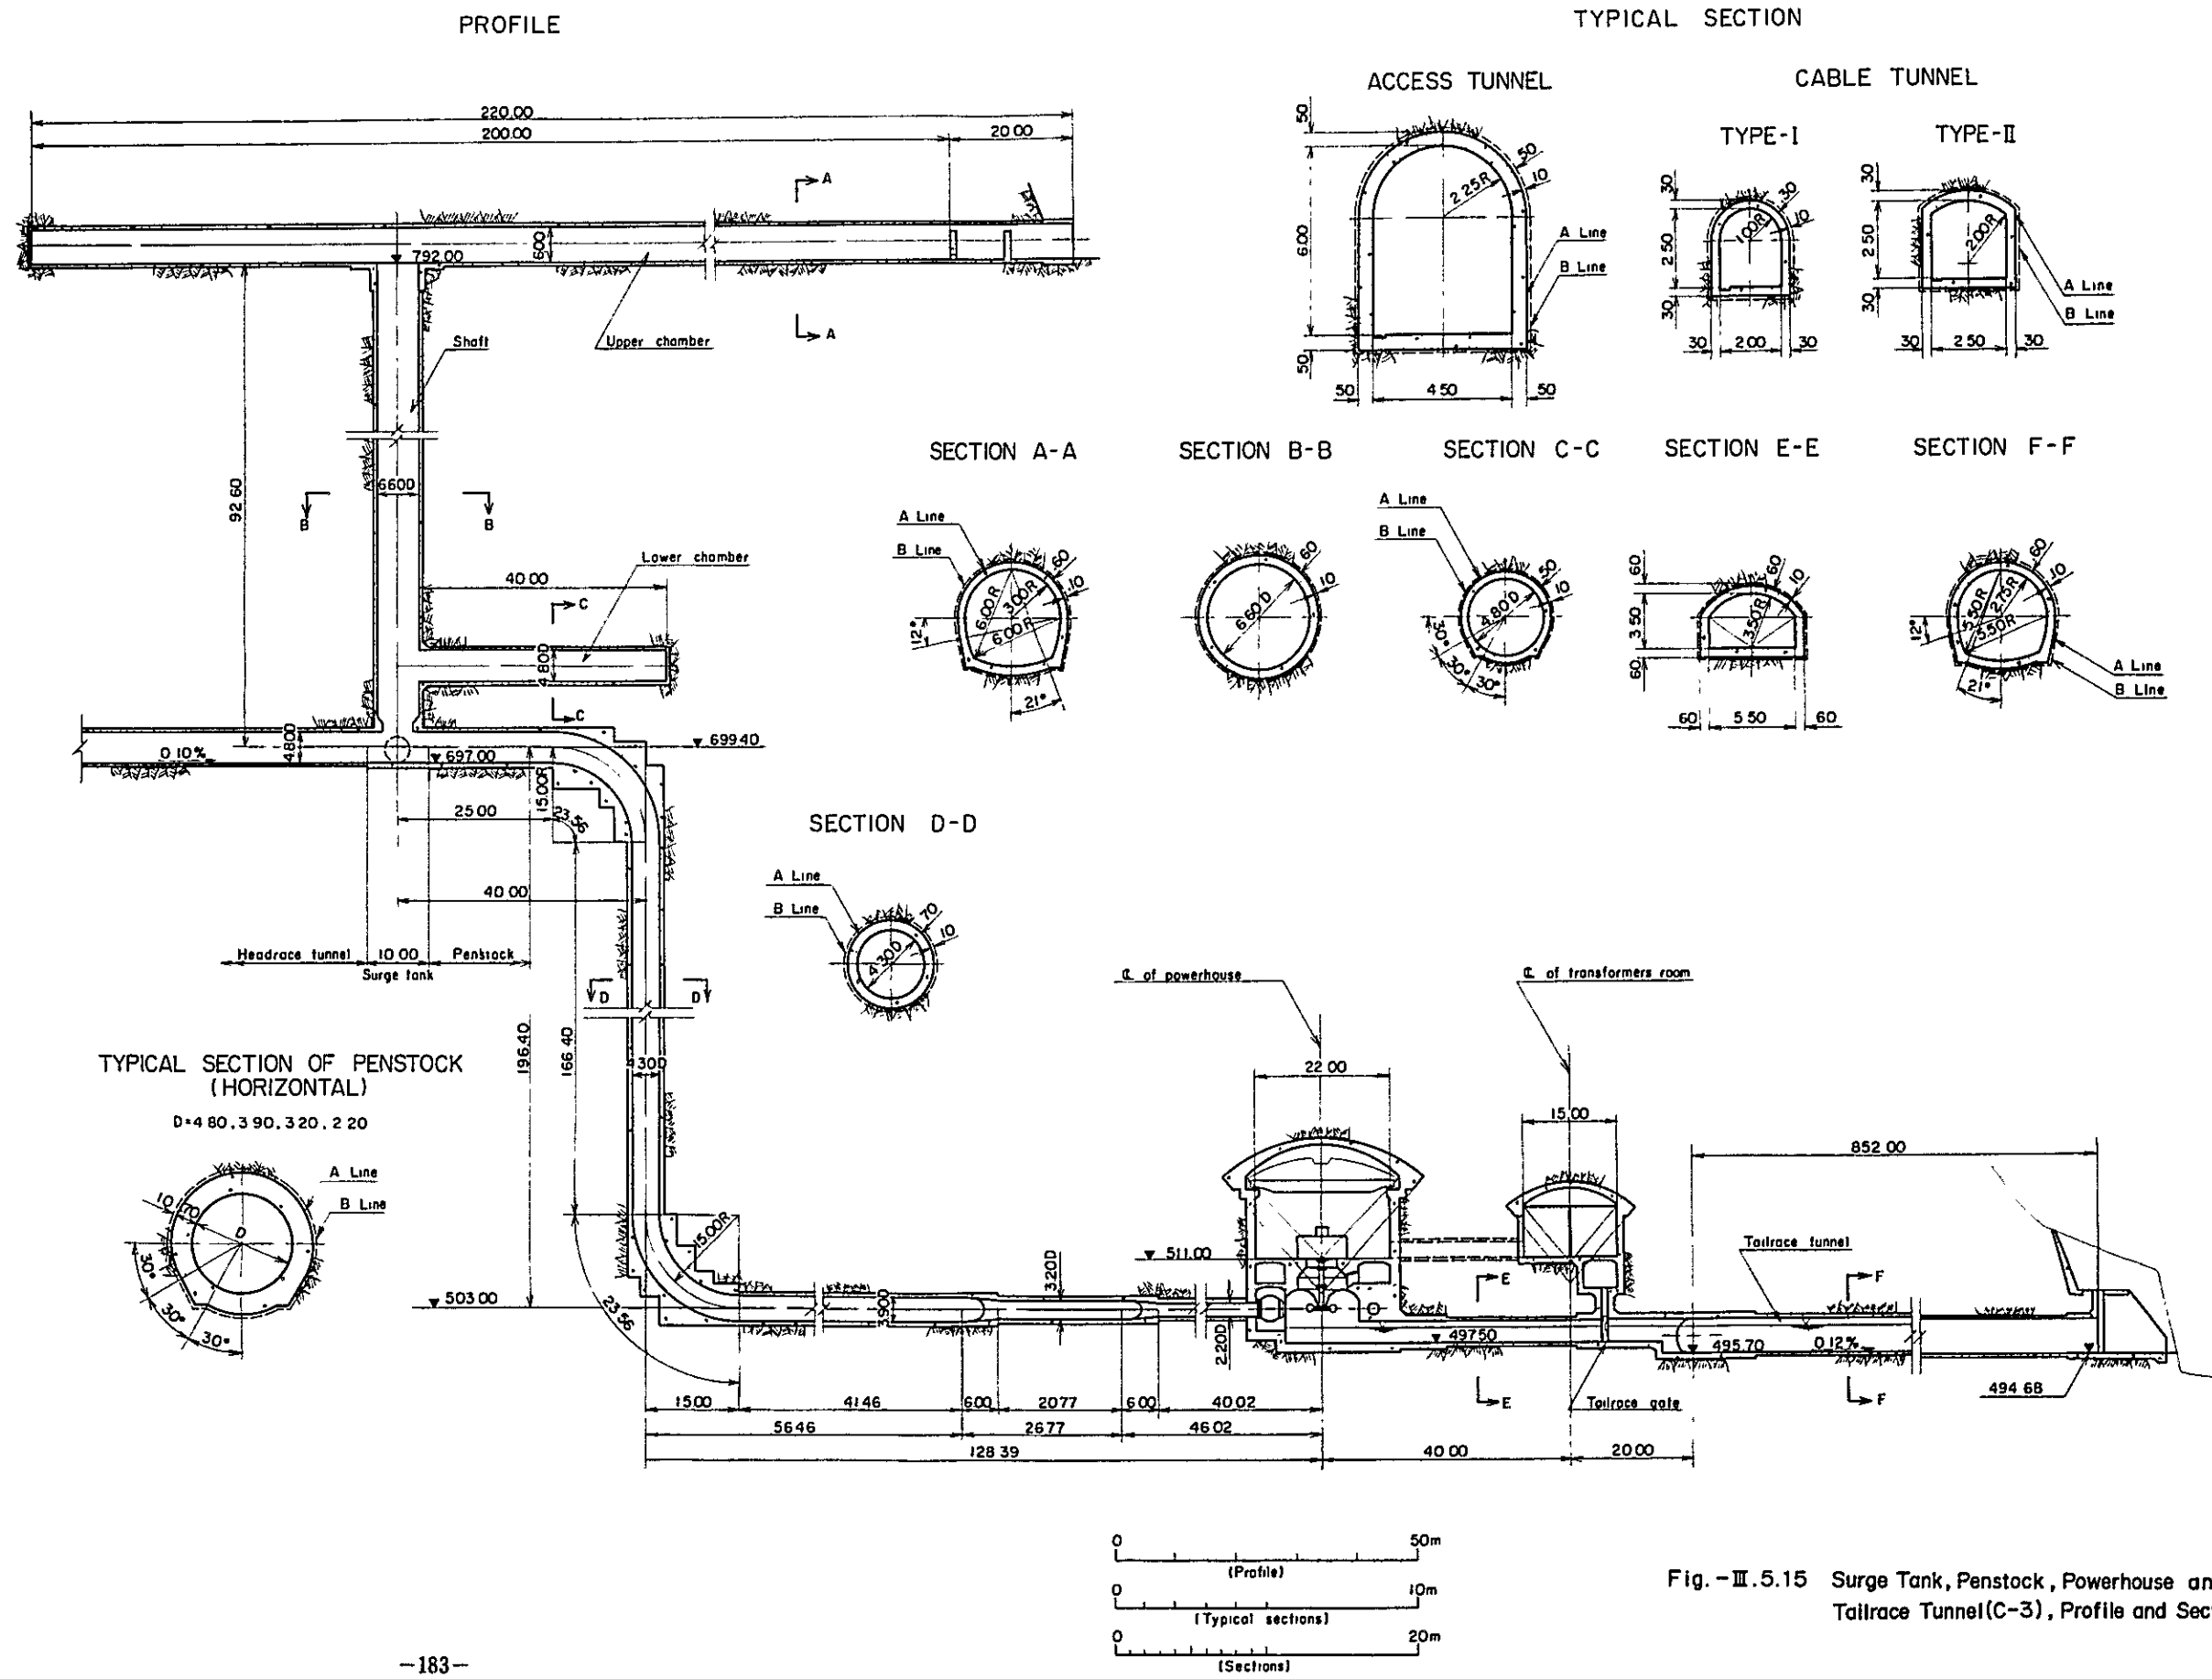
Surge Tank, Penstock, Powerhouse and Tailrace Tunnel(C-3), Profile and Section
